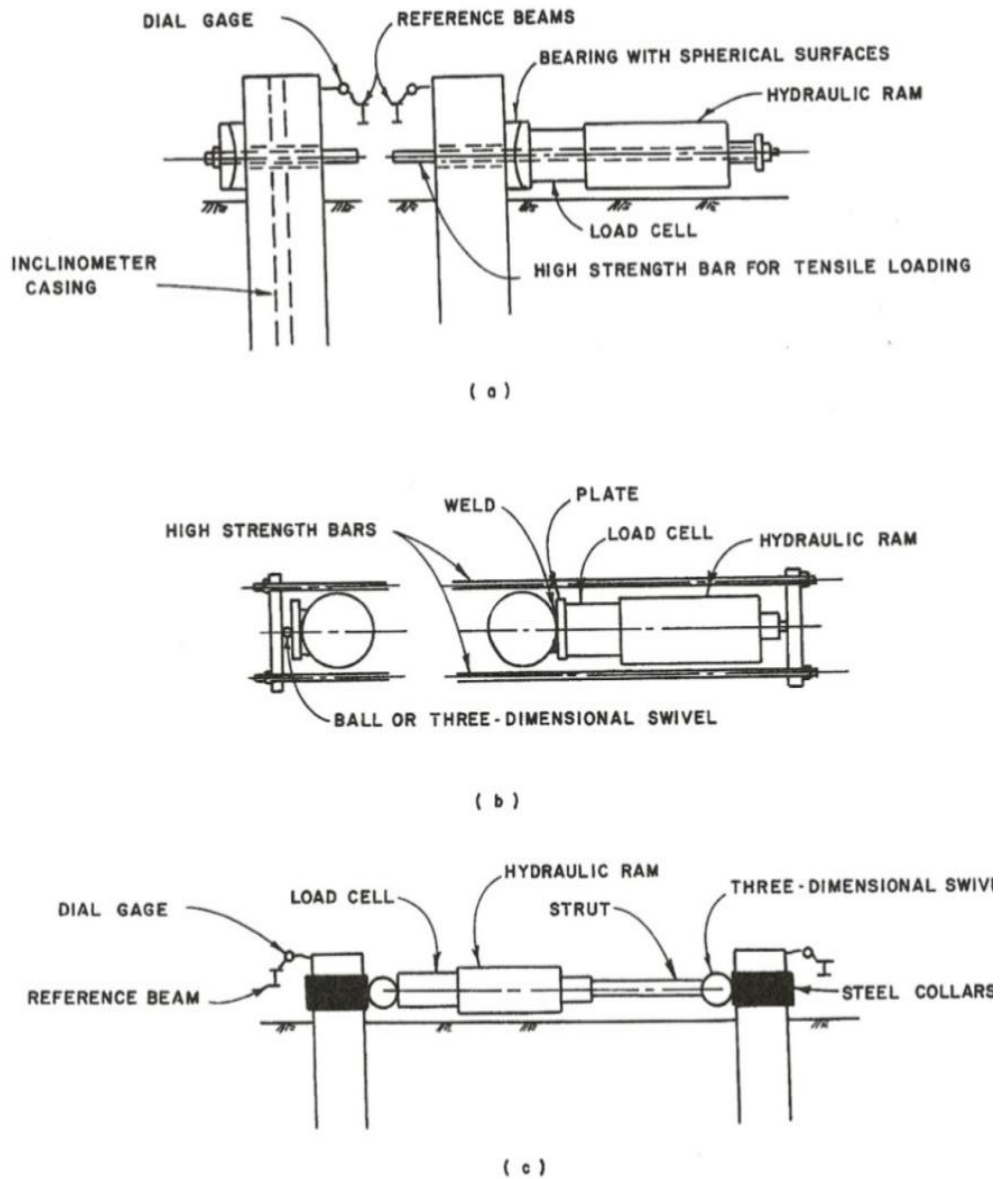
Lateral load testing arrangement (ASTM D3966-07)
